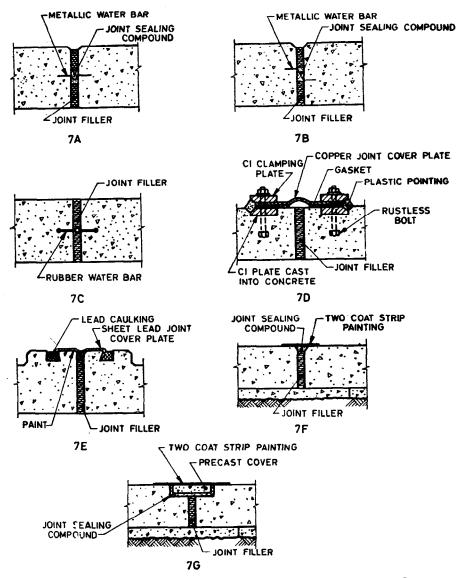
TYPICAL DETAILS SHOWING USE OF JOINTING MATERIALS IN MOVEMENT JOINTS (EXPANSION TYPE)
